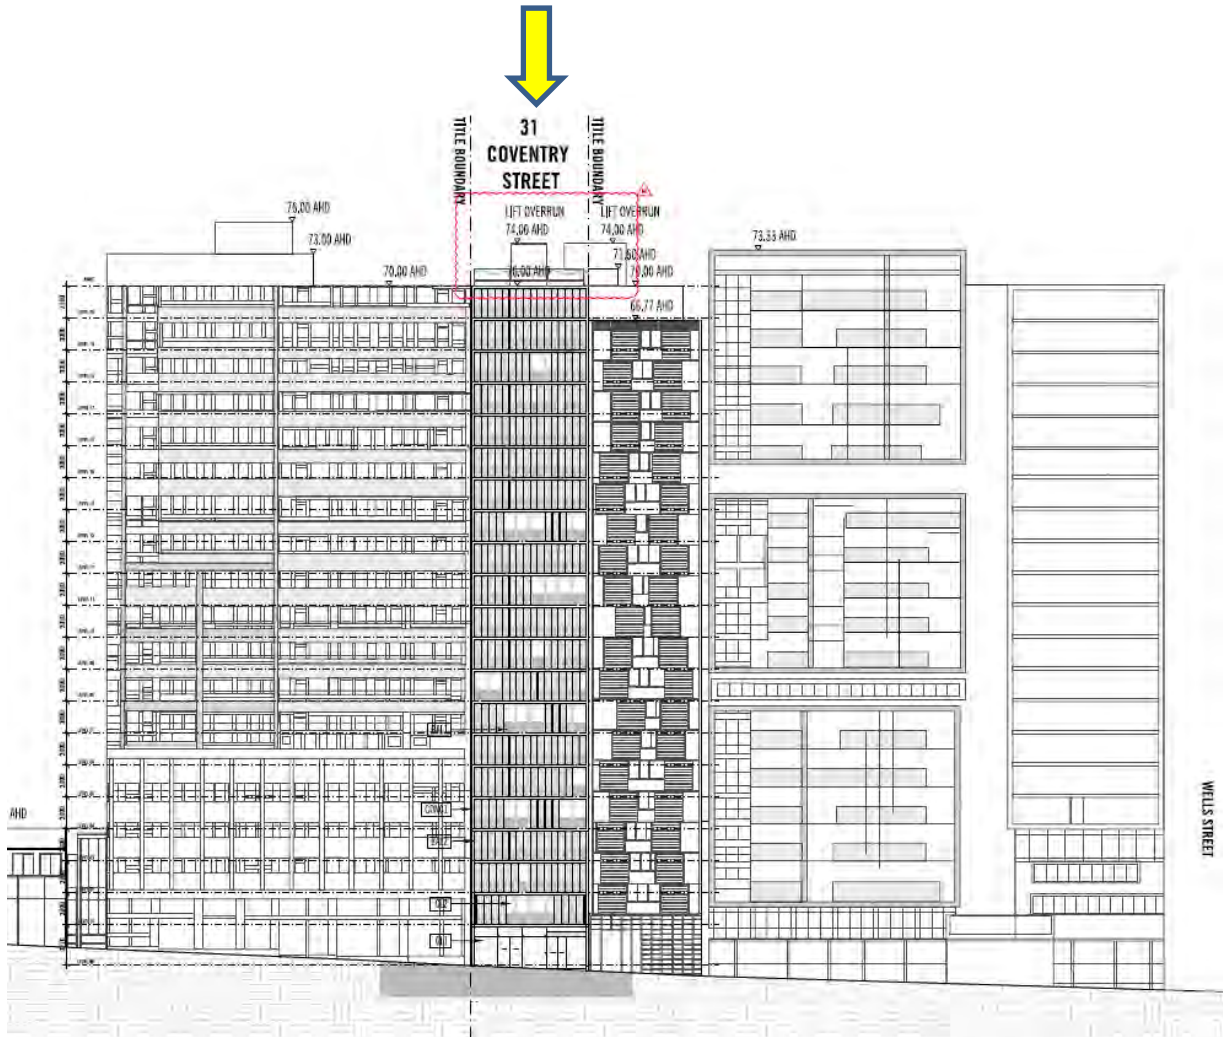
Approved building at 31 Coventry Street, Southbank (source: application plans by Ellenberg Fraser). The building shown to the right of 31 Coventry Street was approved by Permit TP-2012-170.
